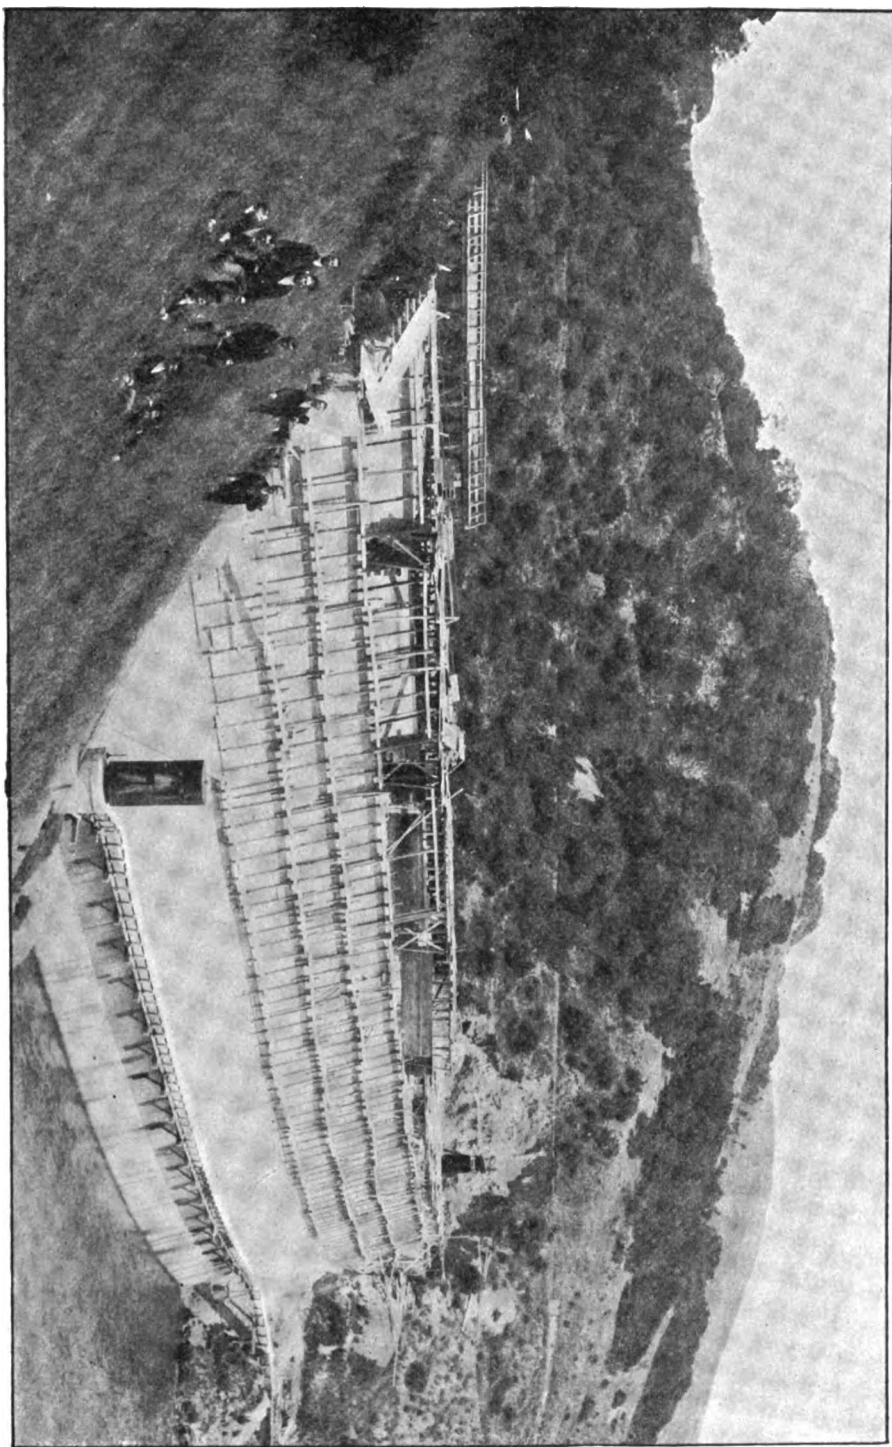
CONSTRUCTION OF INTAKE OF SAN MATEO DAM.
